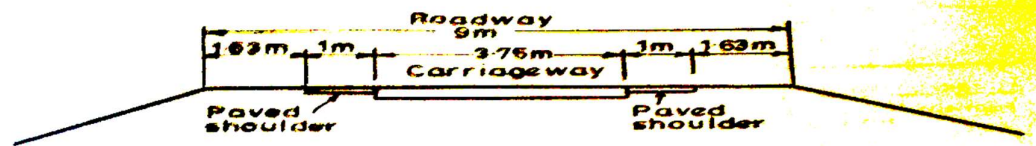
Typical single lane road with paved shoulders. (Major District Road or Other Dist. Road)
